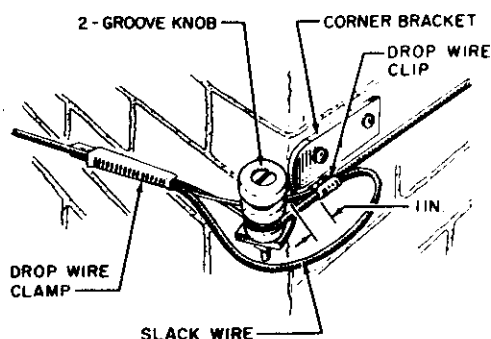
Typical Arrangement of Drop Wire at First Building Attachment, Corner Bracket
